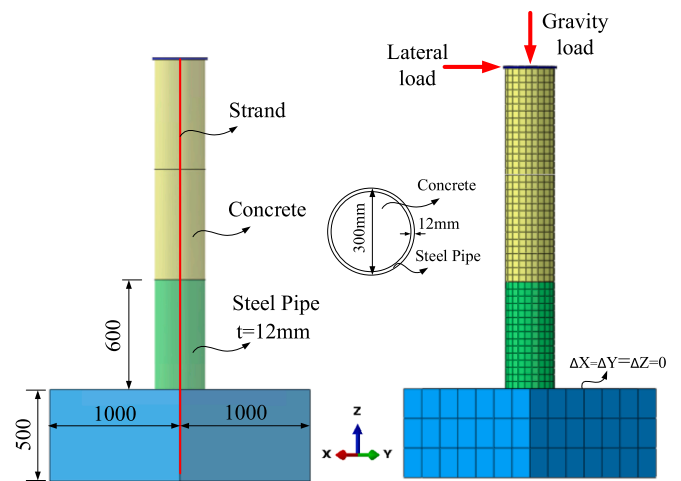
3D finite model for the circular concrete-filled steel tube prefabricated column (Unit: mm).
